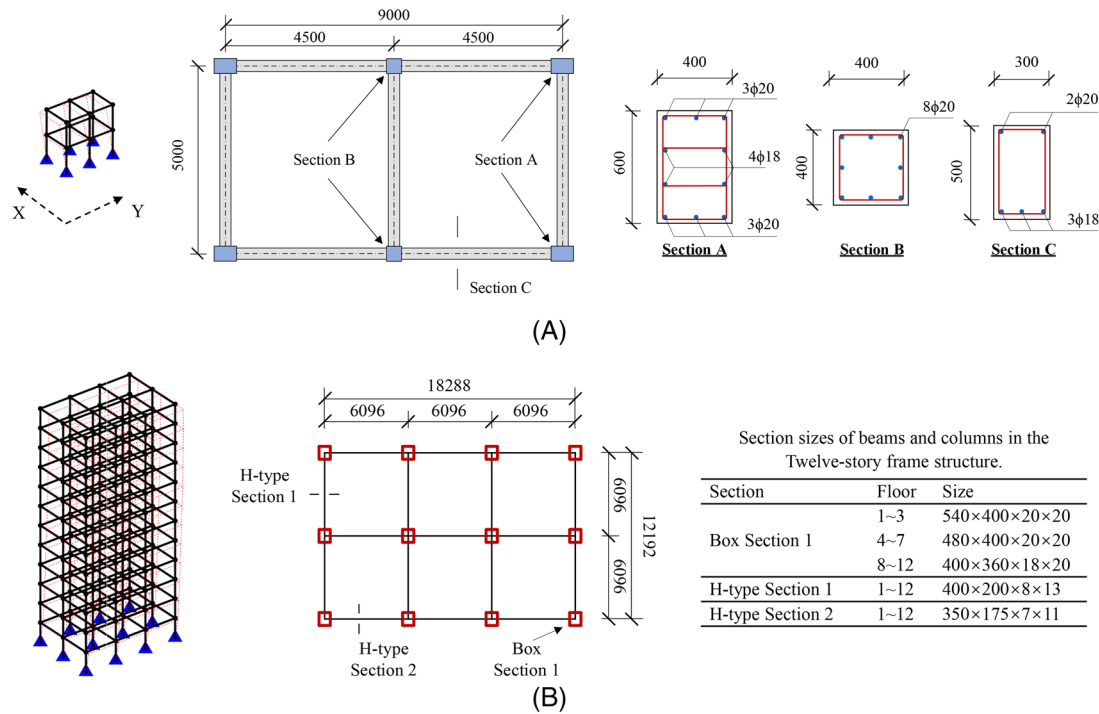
Diagrams and layouts of standard floors and section characteristics of the frame structures. (A) Two-story concrete frame structure; (B) 12-story steel frame structure.
